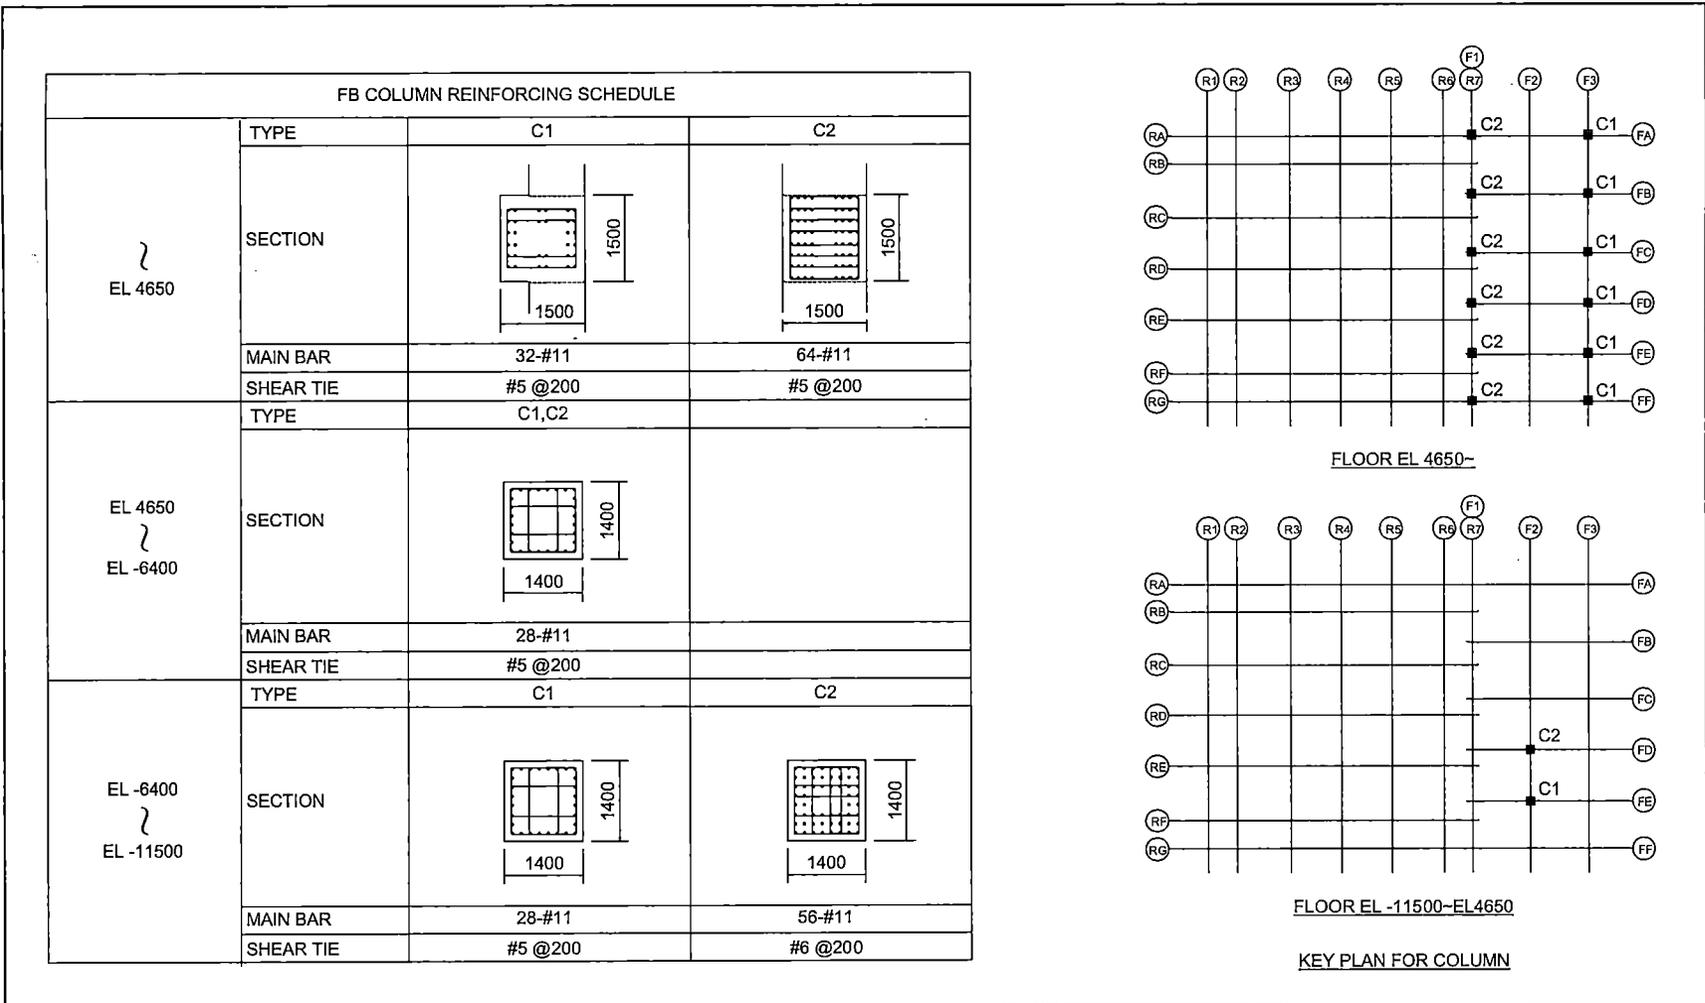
FB Reinforced Concrete Column Reinforcing Schedule
